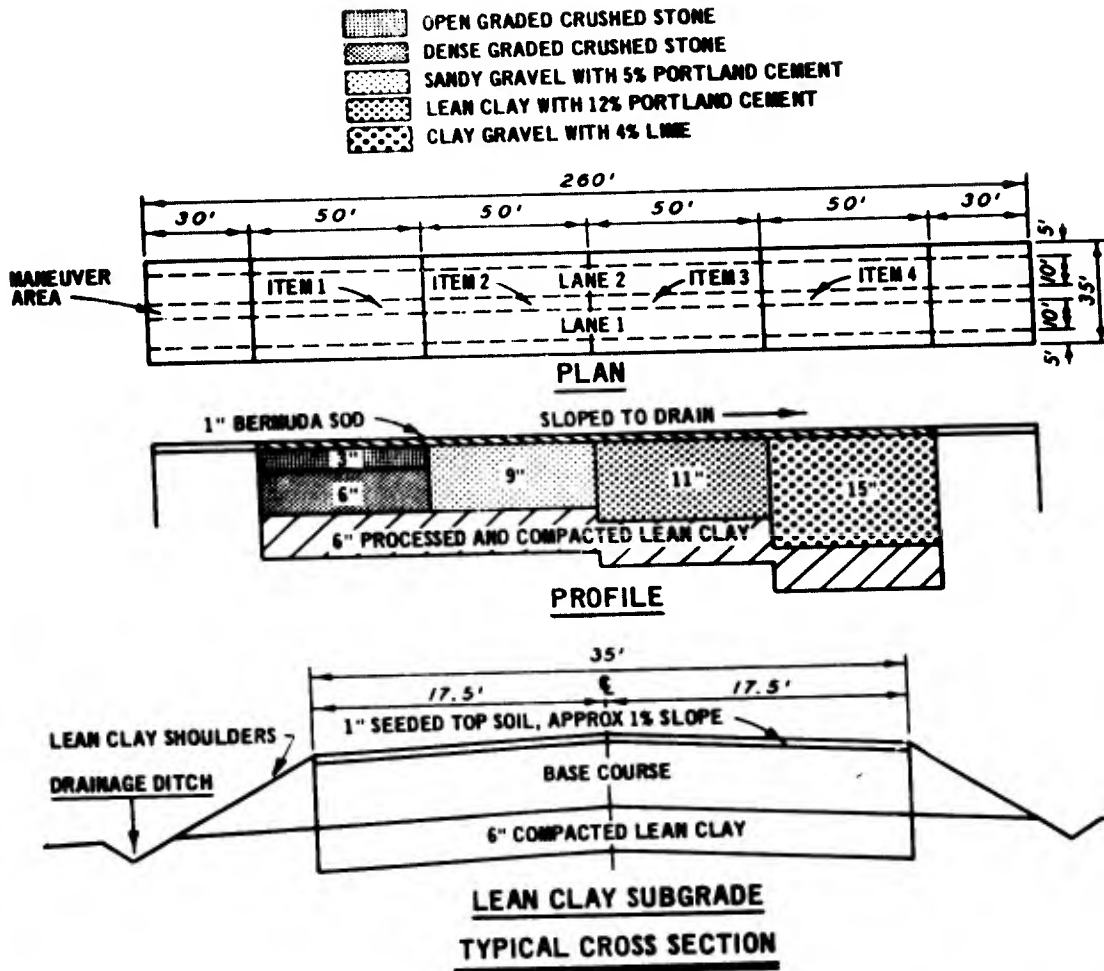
Plan, Profile and Typical Cross-Section of Test Section
